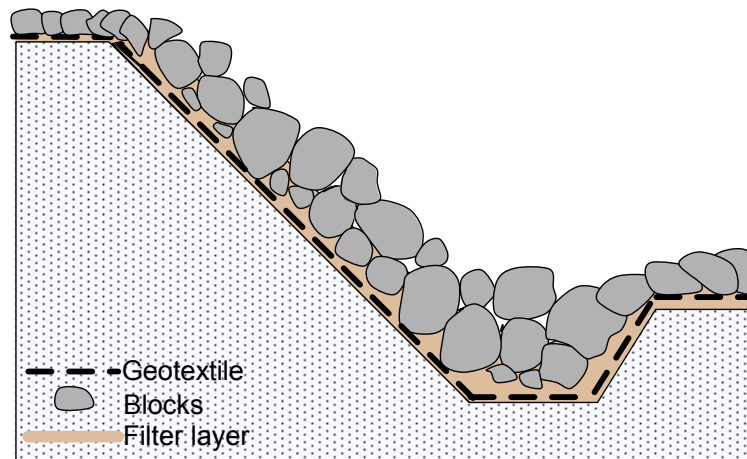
Schematic view of a Riprap protection over a downstream slope
